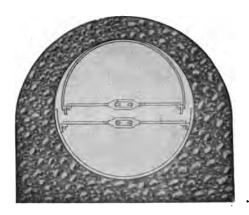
CENTER FOR 8-FOOT CONDUIT,
